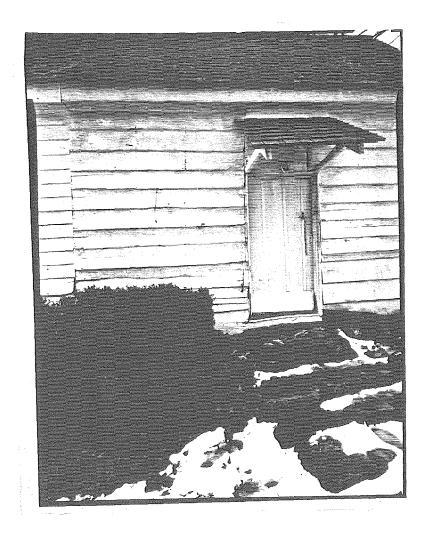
Bunker Hill Quarter, detail of door on southeast elevation, looking west.
